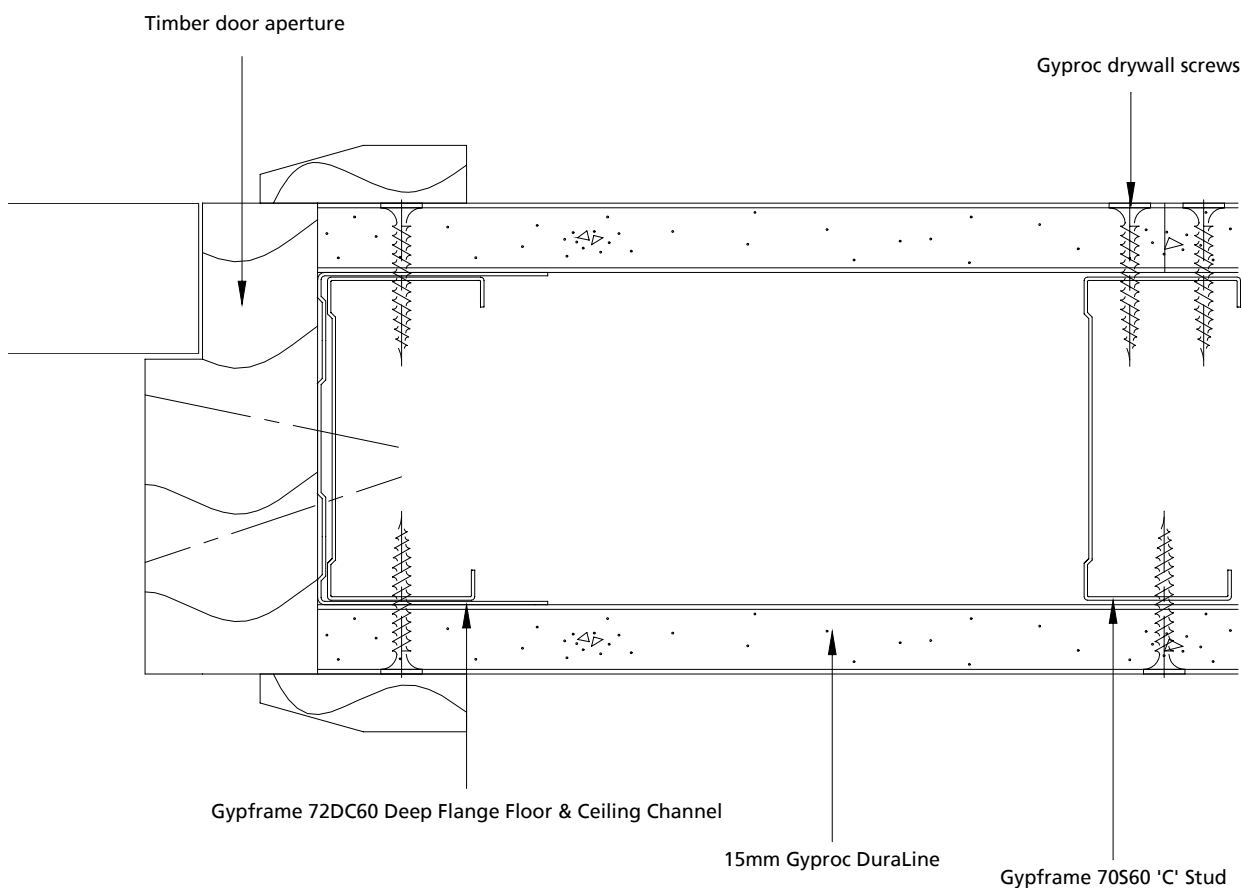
Cross-sectional view through test construction BTC 13458S showing the door detail.
